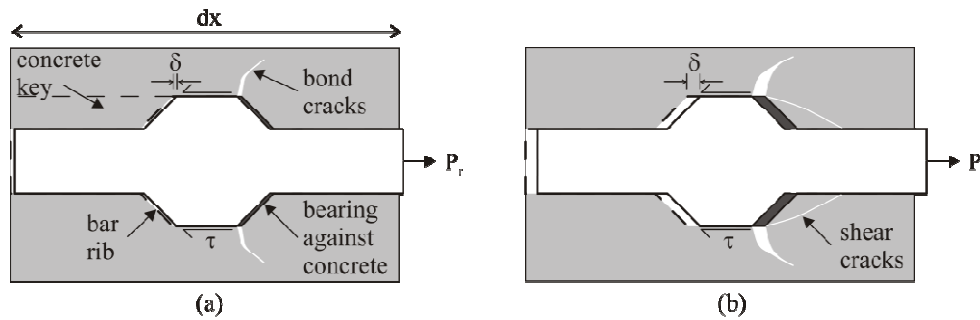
damage of concrete as bar pulled (a) formation of bond cracks, (B) formation of shear cracking
